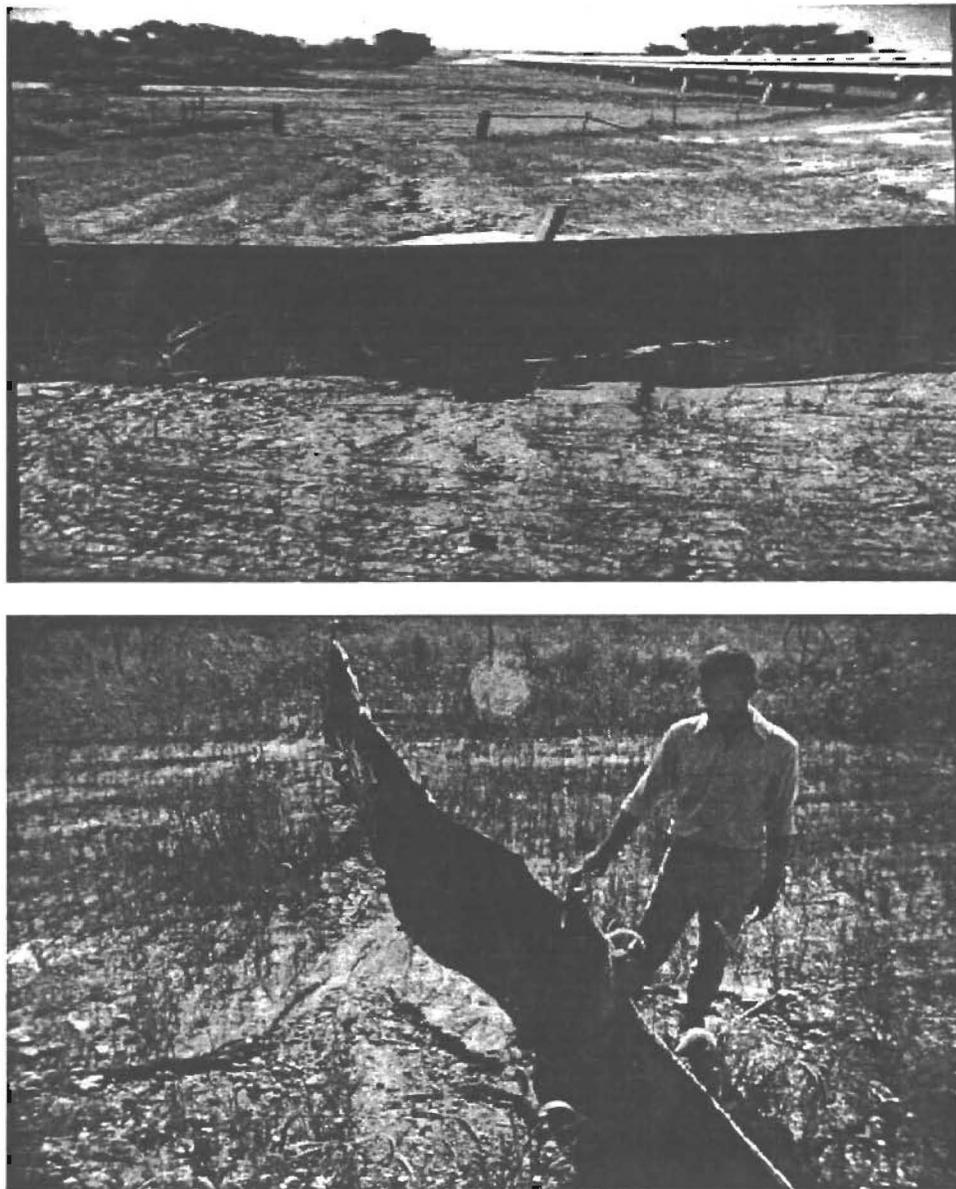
Failed silt fence and erosion of soil and grass cover in the east roadside channel north of the U.S. Highway 83 bridge crossing of the Middle Pease River in Childress County. Poor control of road surface runoff immediately following construction and prior to establishment of the grass lining in the roadside channel, and lack of follow-up maintenance, has resulted in erosion.
